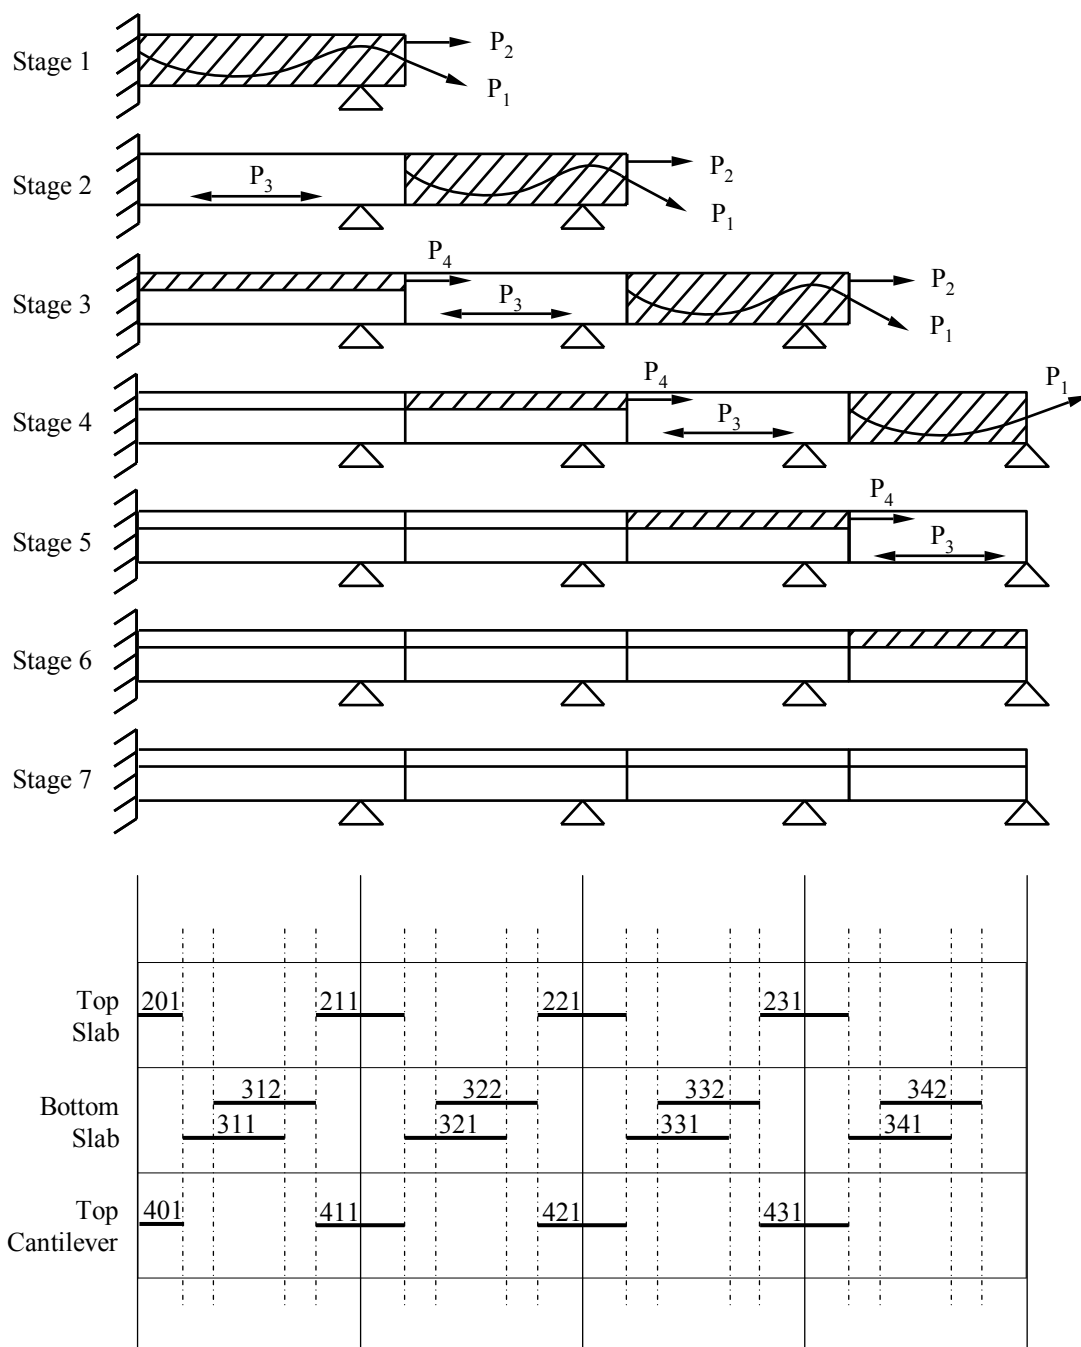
Bow River Bridge Prestress Sequence and Layout
